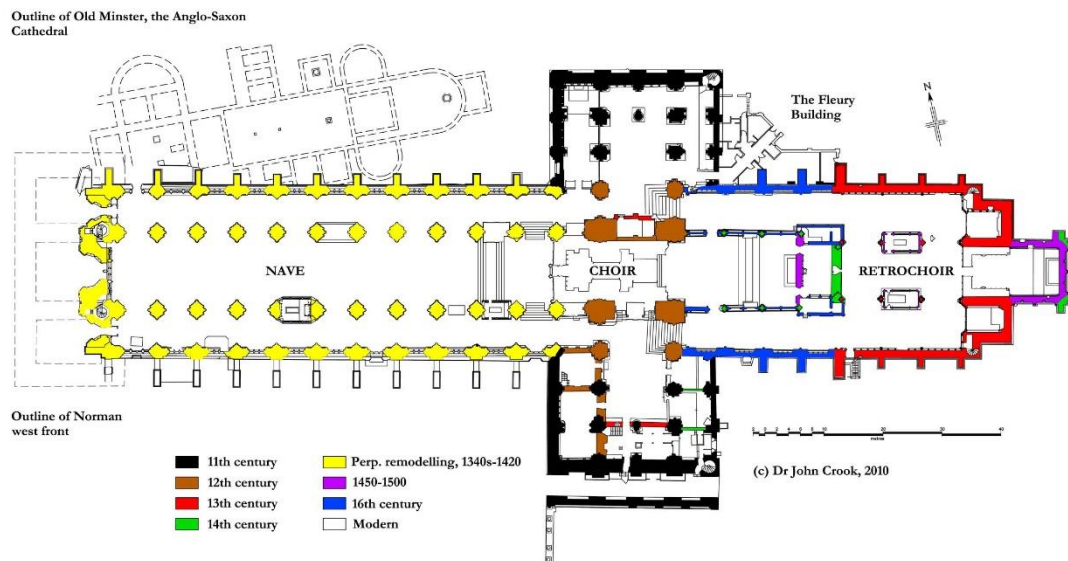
Plan of Winchester cathedral illustrating the stages of construction.
